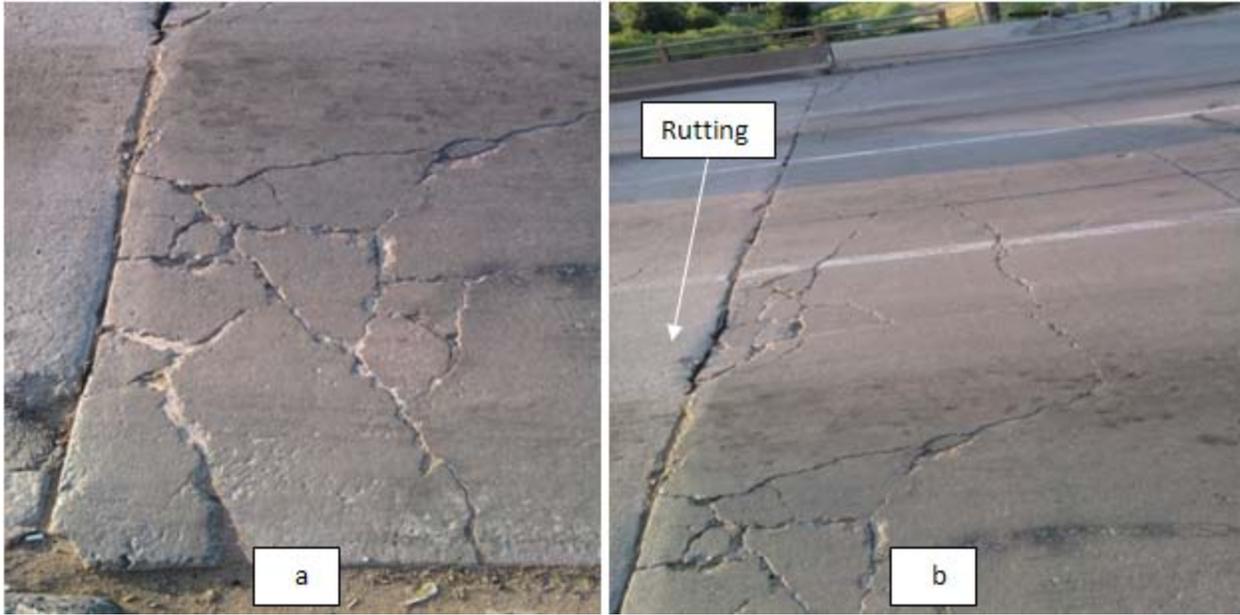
Photos from west side of intersection on SH – 51. Photo a is at the intersection of the overlay and the concrete bridge. Rutting can be clearly seen in photo b.
